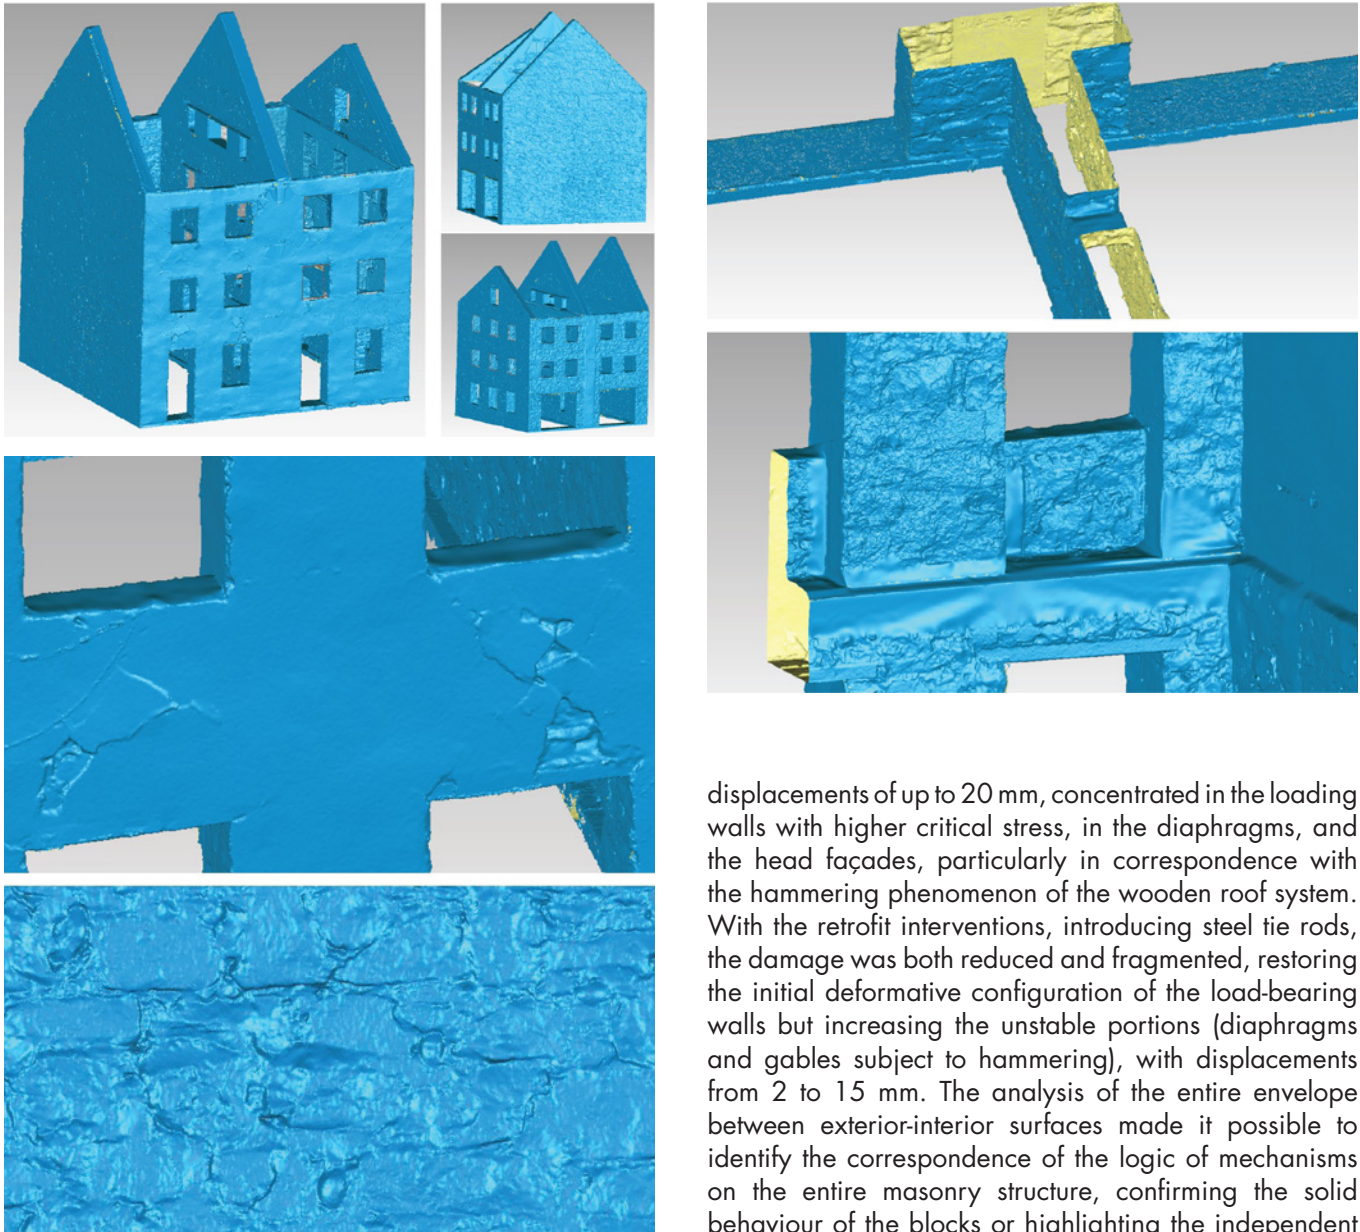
Morphological qualities of the final structural 3D mesh: watertight envelope of the model, geometric integration in building profiles, preservation of shape detail on cracks, deformations and overall wall texture.
